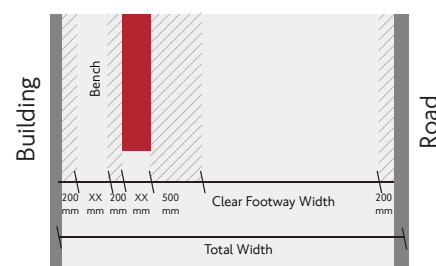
Examples of Location Where Bench Replaces Building Buffer
